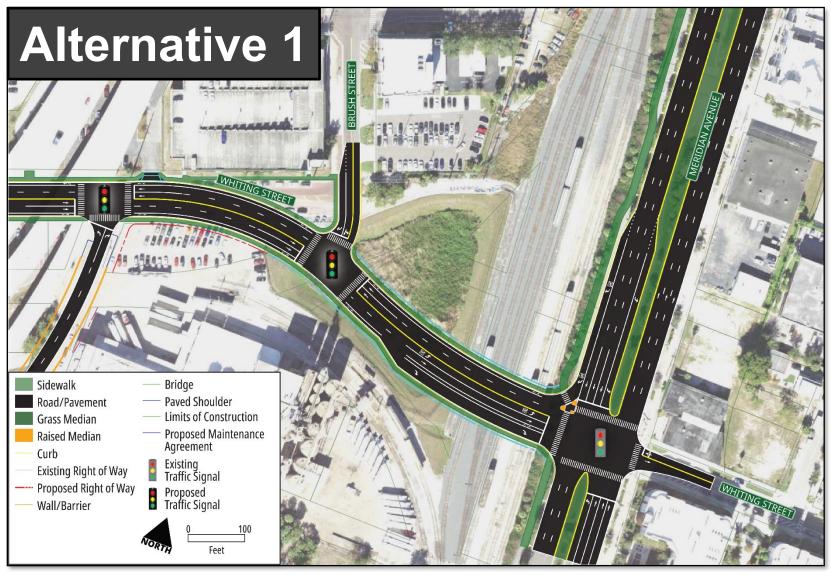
Alternative 1 – Whiting Street from Brush Street to Meridian Avenue
